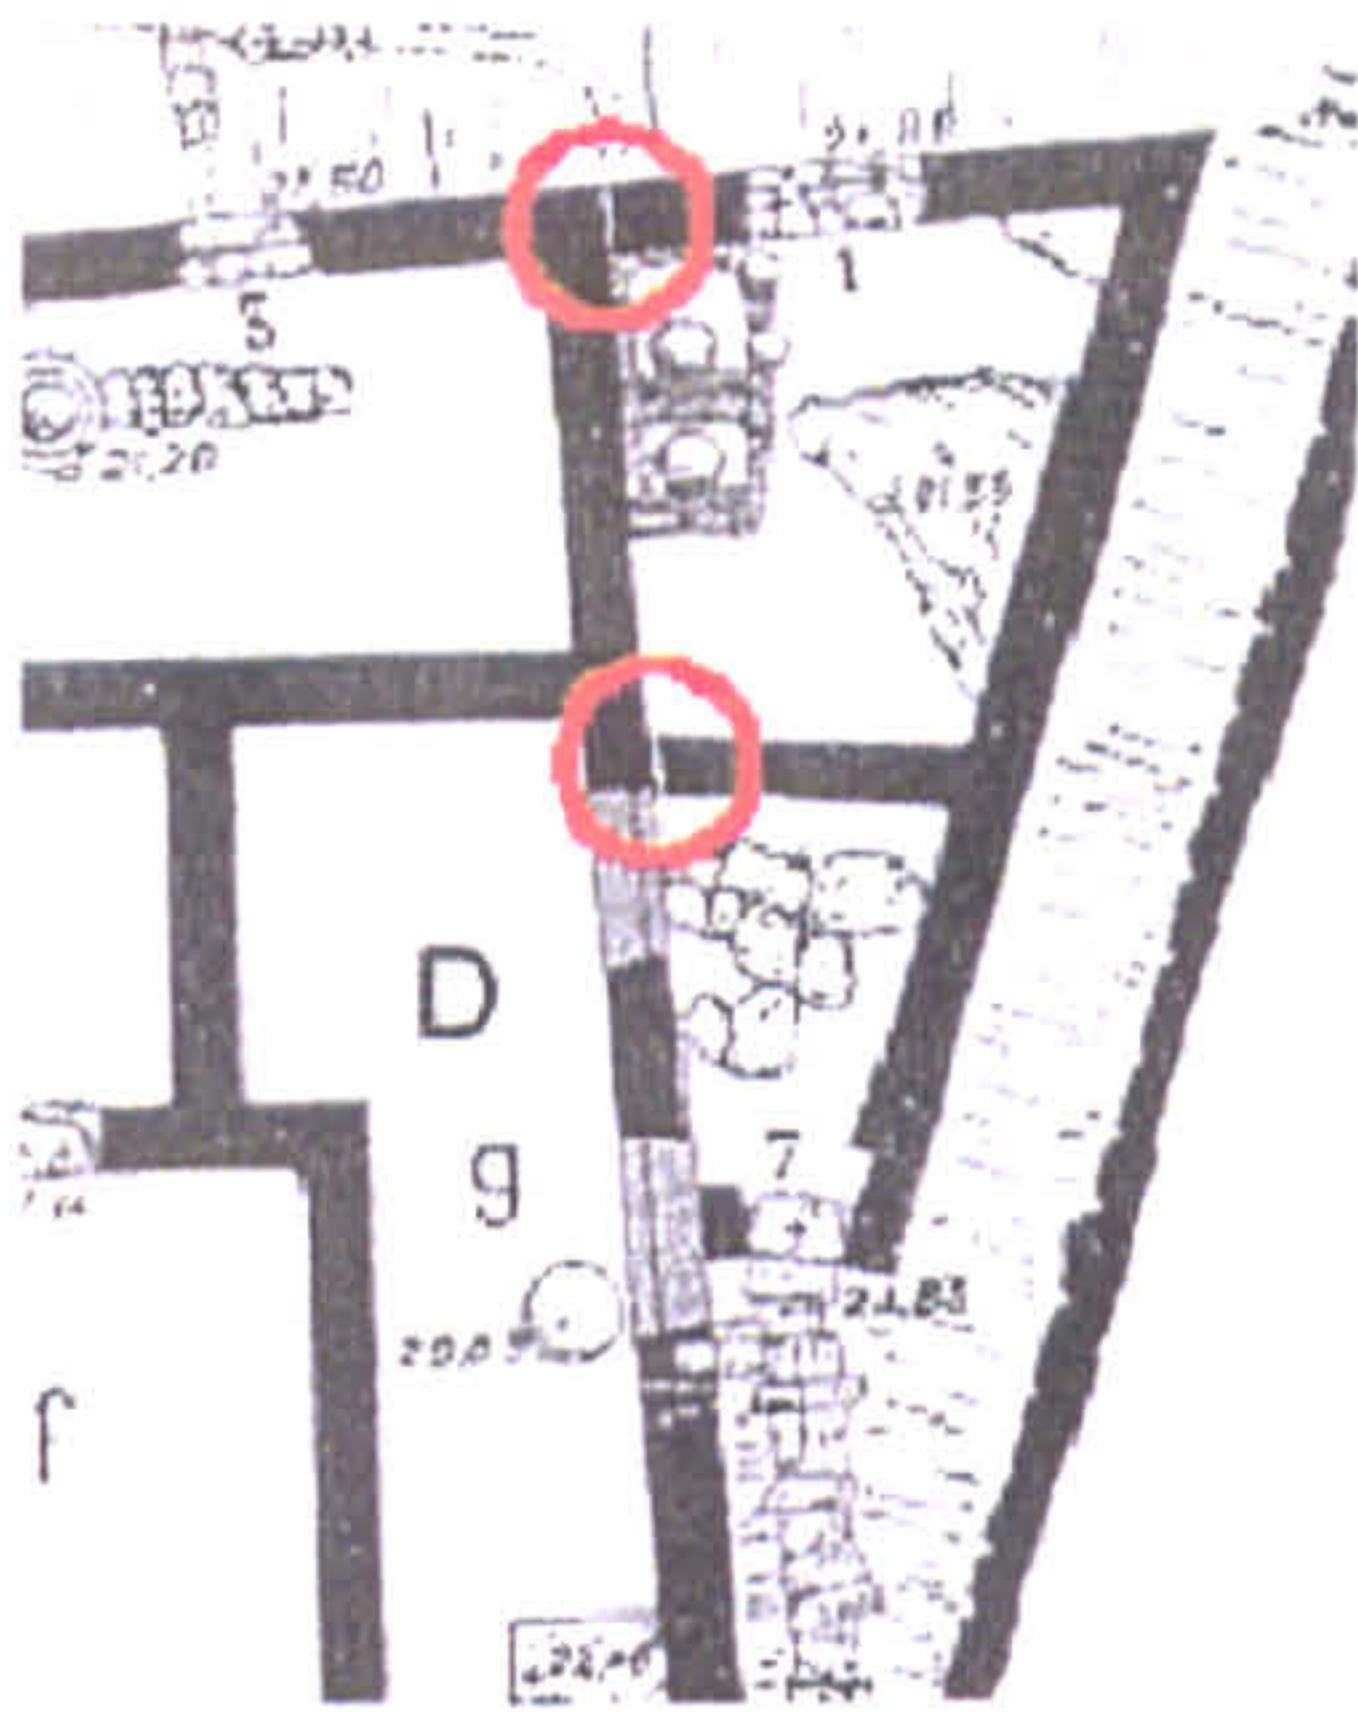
Wall abutments between house II D and adjacent shops (STR 1 and Rd1 7)
